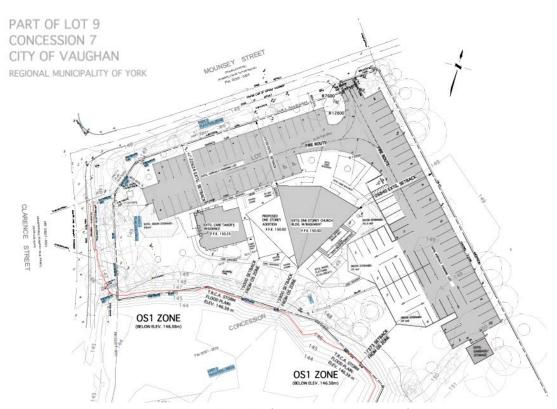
Proposed site plan (C.Y. Lee Architect Inc, 2019.).
